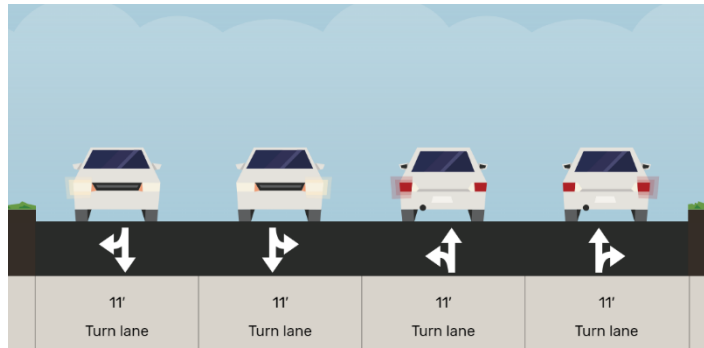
Annandale Road Existing Conditions Typical Cross Section
